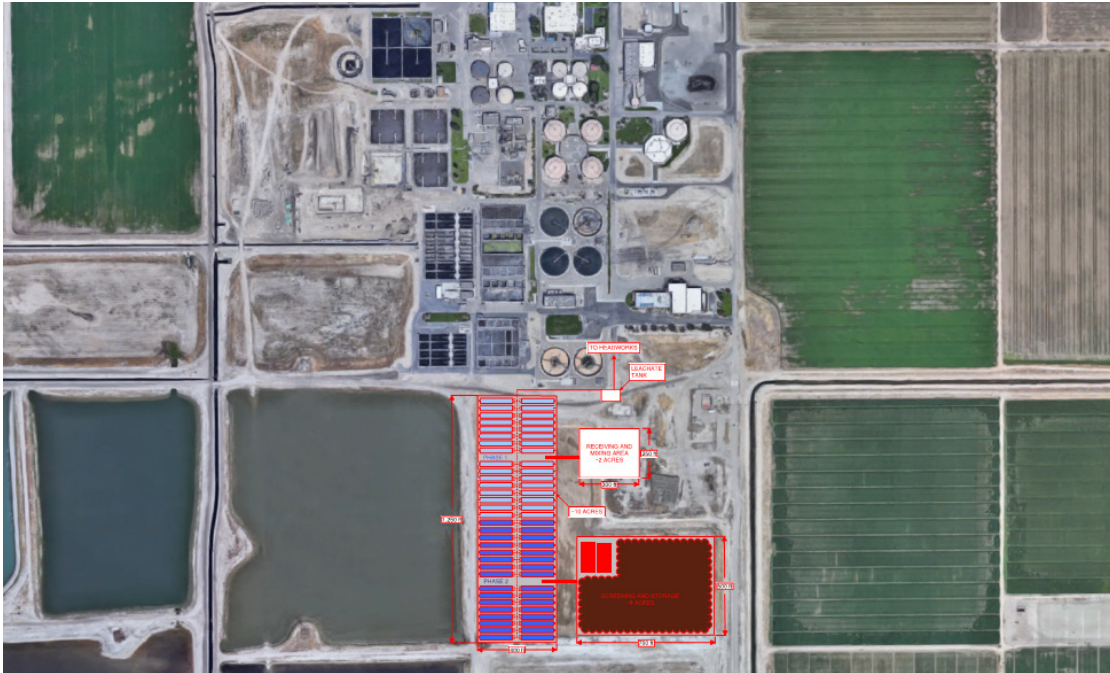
Covered Aerated Static Pile (ASP) Compost Site Layout
